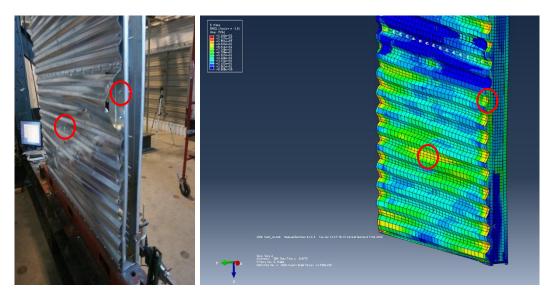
Model 1: sheathing to frame connection failure
